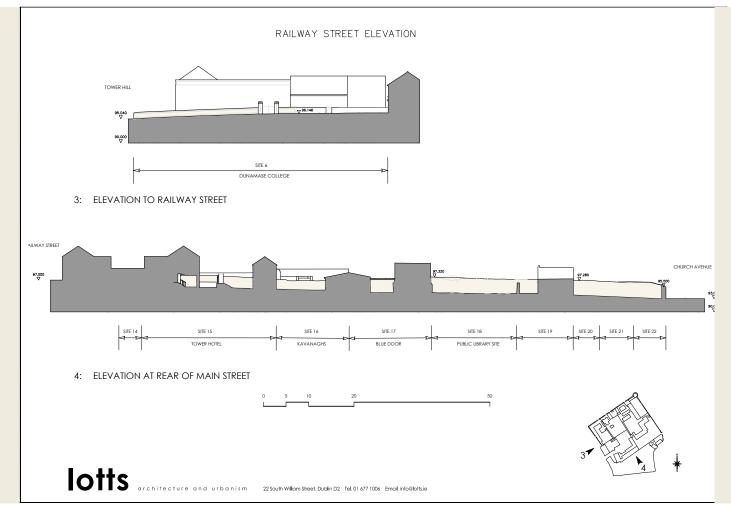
Survey drawing (elevation to Railway Street and elevation at rear of Main Street)
